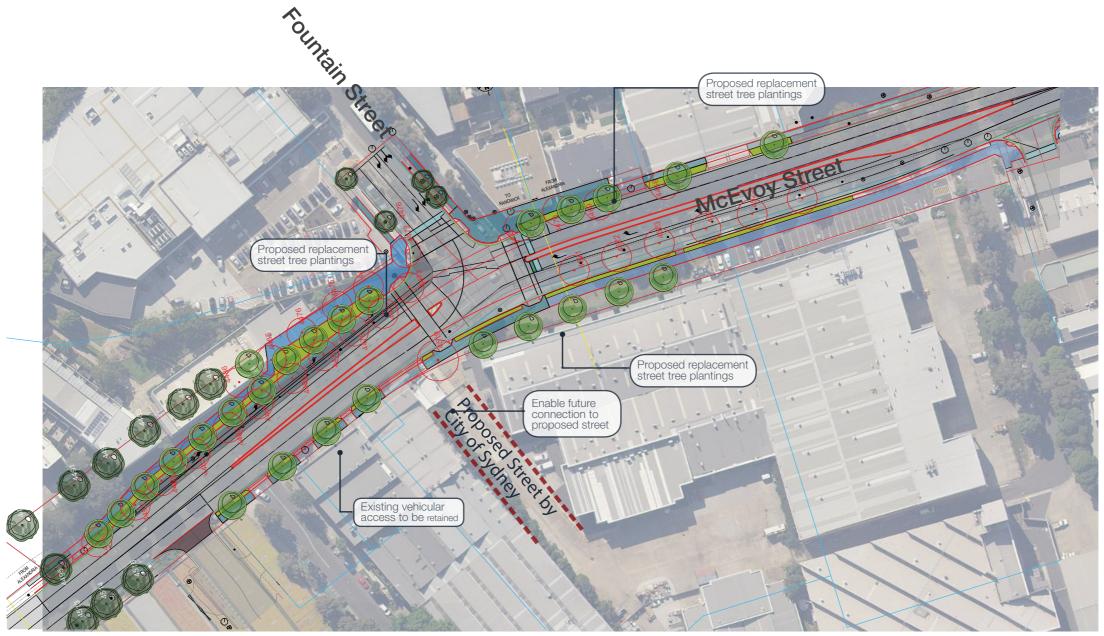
Zone 1 - McEvoy Street and Fountain Street
